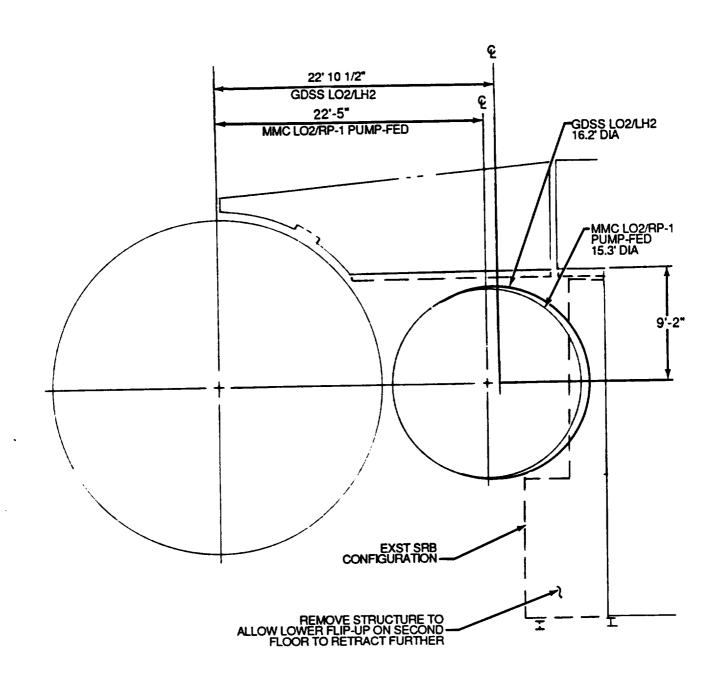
3rd Floor - Platform 'D' Interferences.
